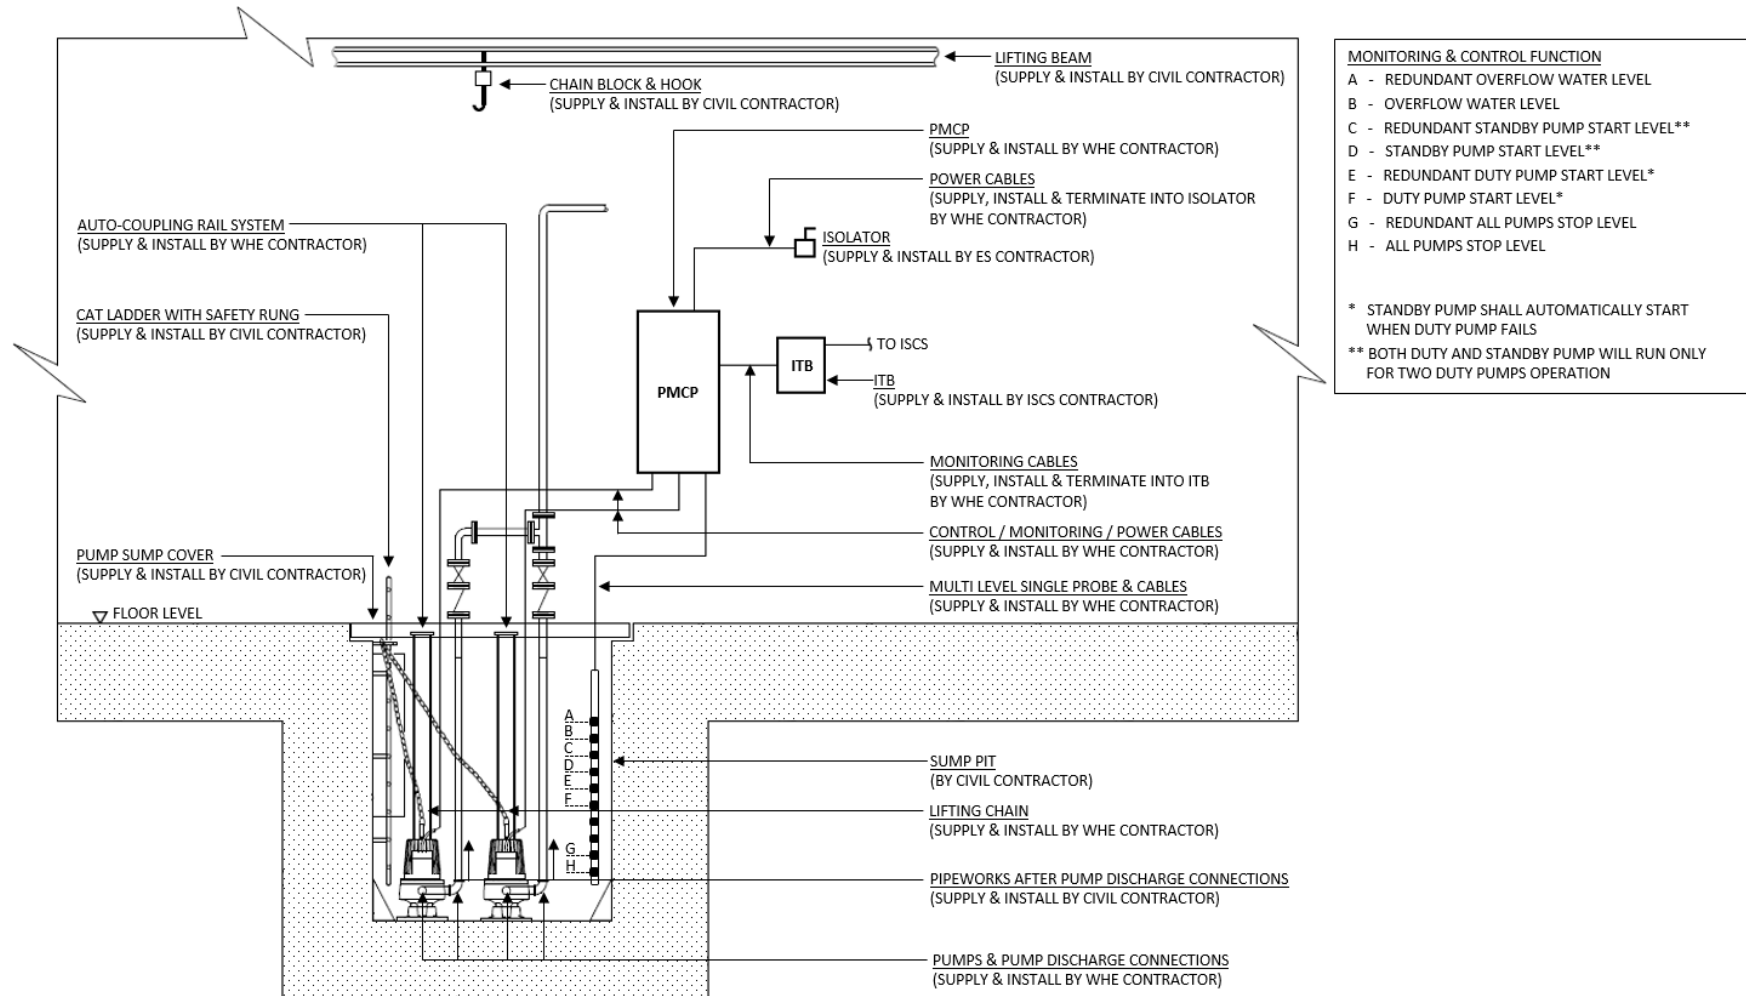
TYPICAL INTERFACE & INSTALLATION REQUIREMENTS OF STATION DRAINAGE SUMP PUMPING SYSTEM
